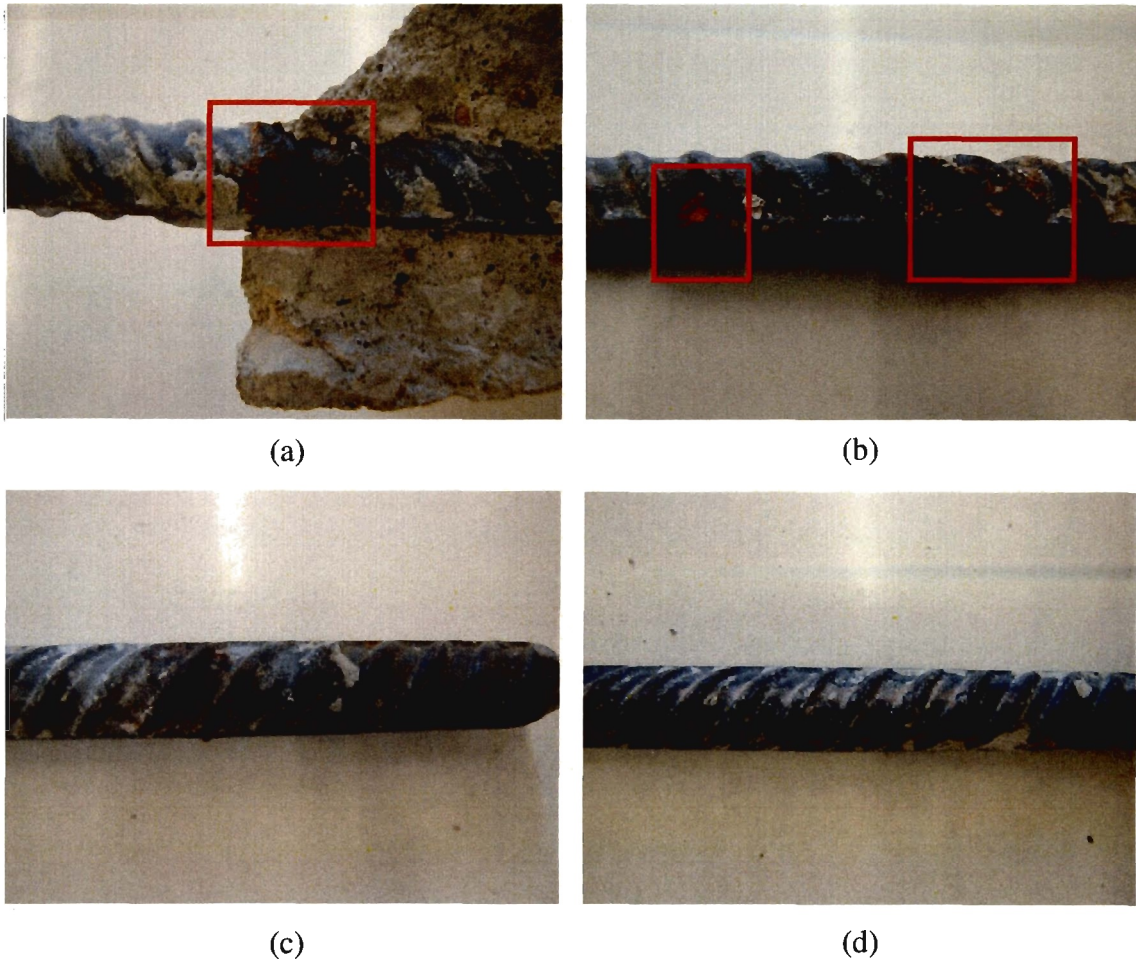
Reinforcement examination of Mix No. 2 containing 4 bars. (a) Rebar embedded in concrete showing corrosion development near edge of specimen. (b) Spots of corrosion developed on rebar at $\frac{1}{2}$ in. (12.5 mm) from reservoir surface. (c) and (d) Minimal to no signs of corrosion at 1 in. (25mm) from reservoir surface.
